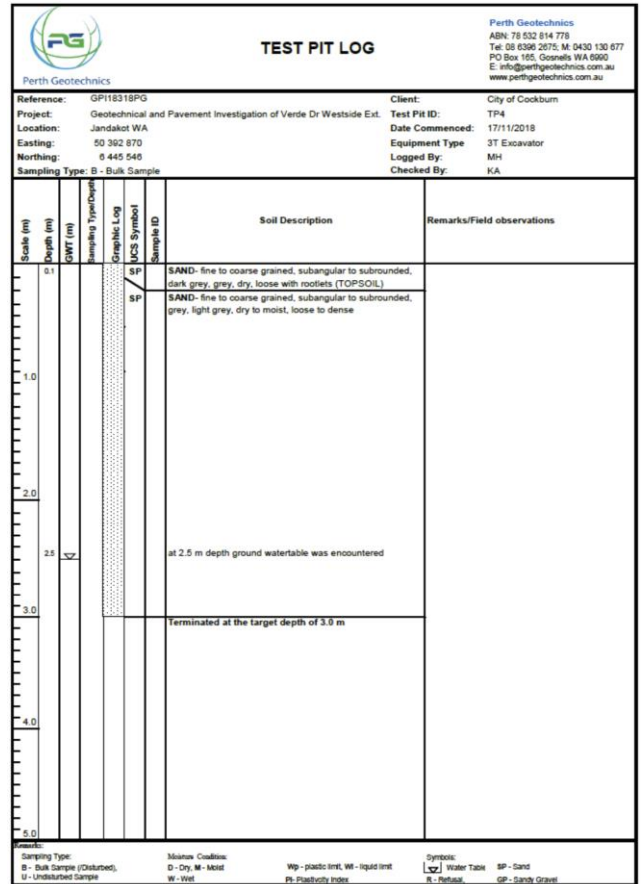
Test Pit Log (Verde Dr.) at Location TP4
